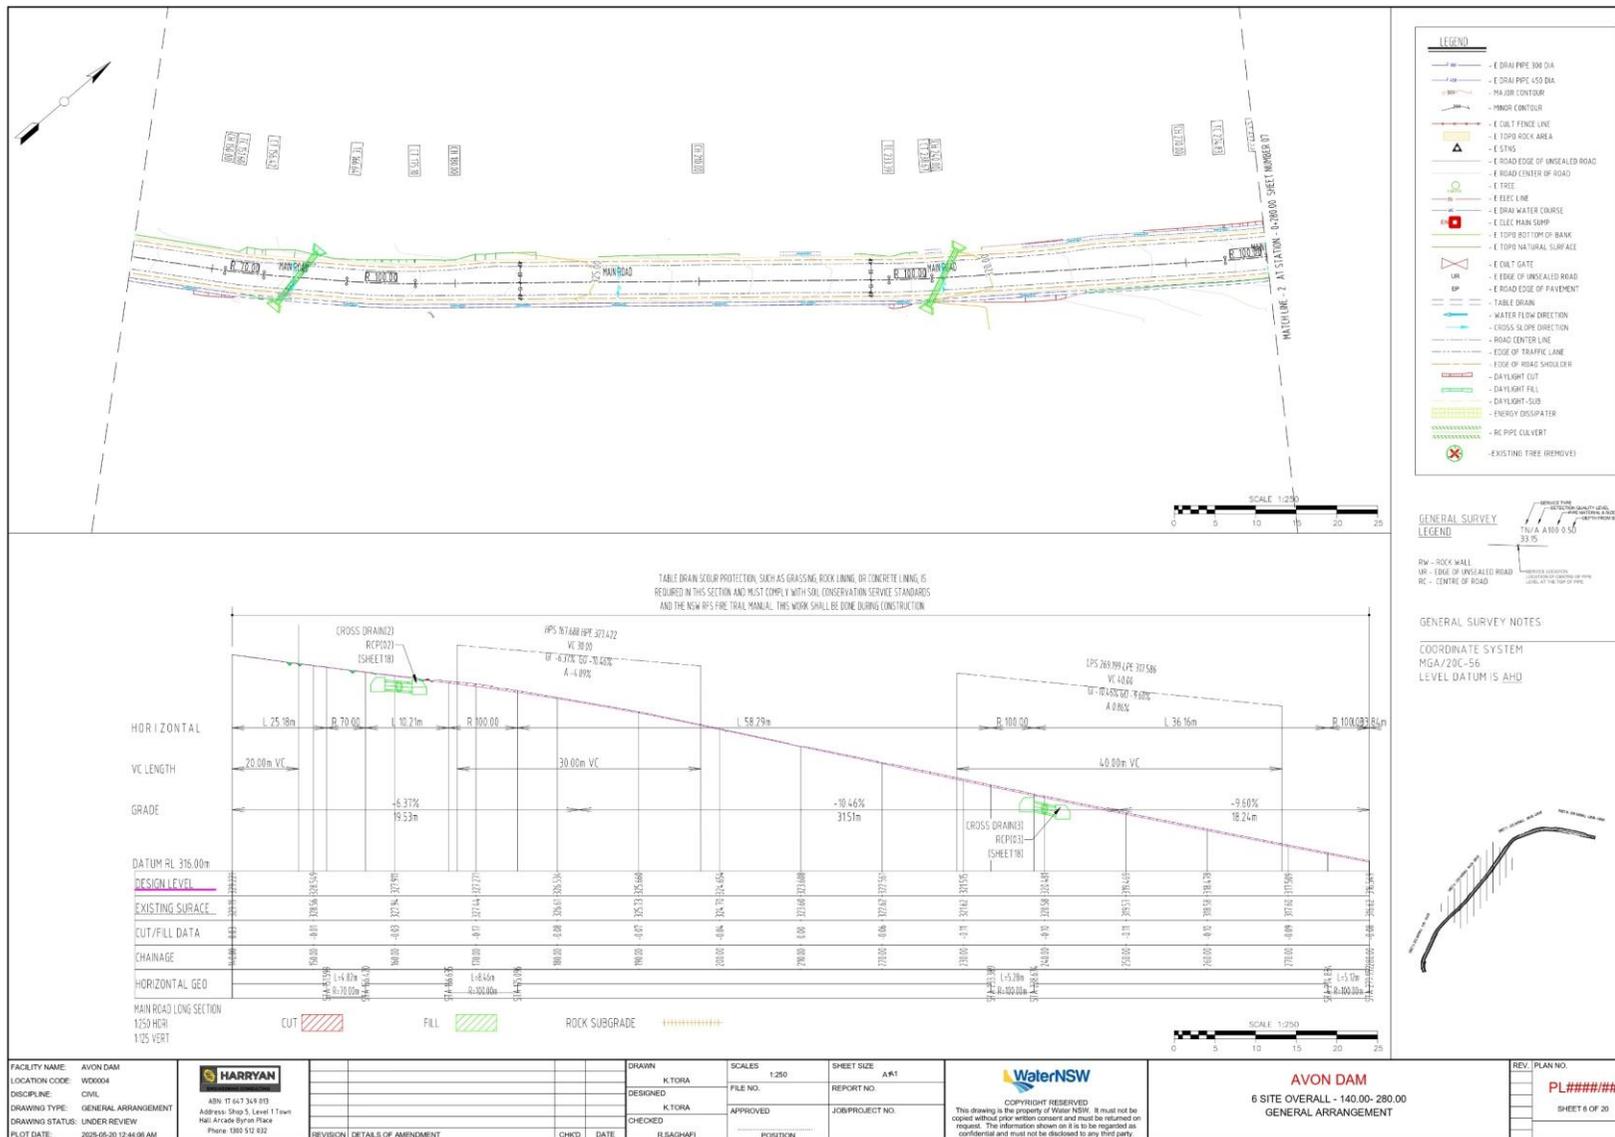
Map ID Section 1 (Main Road) proposed works overview Sheet 6 (Source: Water NSW, May 2025)
